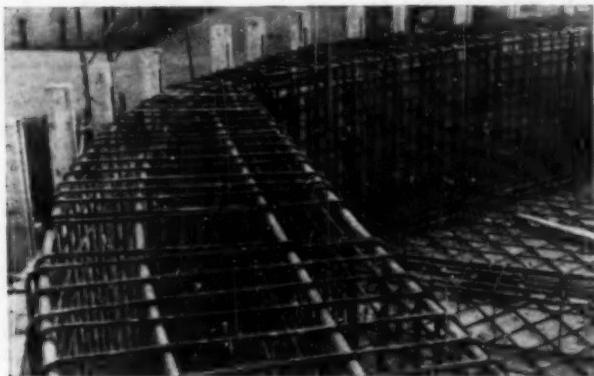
Reinforcement for Beam at Base of Tank Wall.
